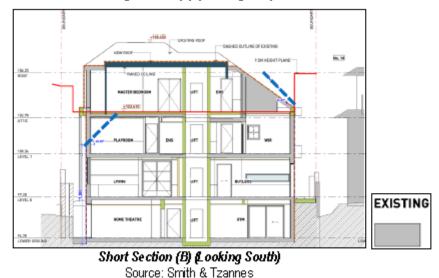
Proposed Height and Inclined Plane at Section (Inclined Plane in Blue)
